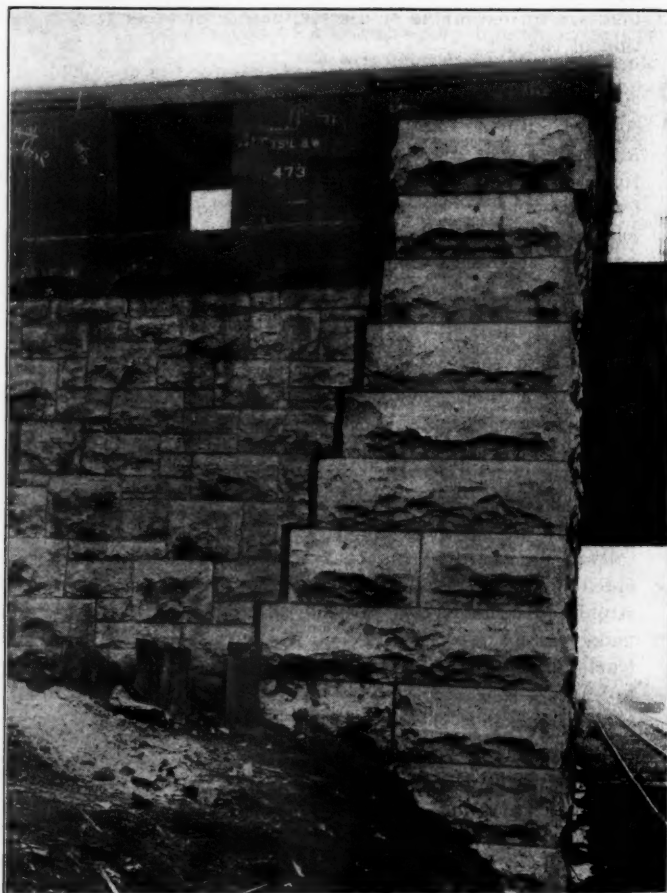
Retaining Wall Tipped Because of Excessive Toe Pressure.
